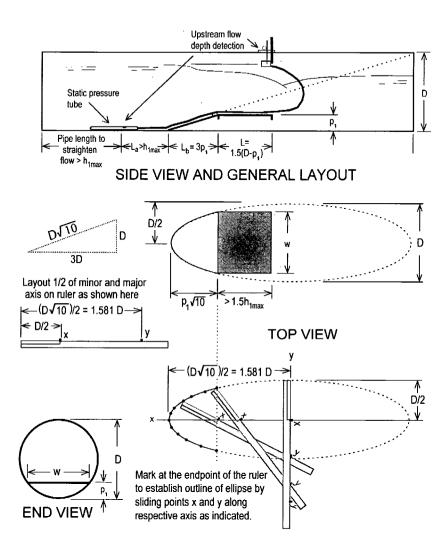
Layout scheme for portable long-throated measurement structures in partially full circular conduits.
